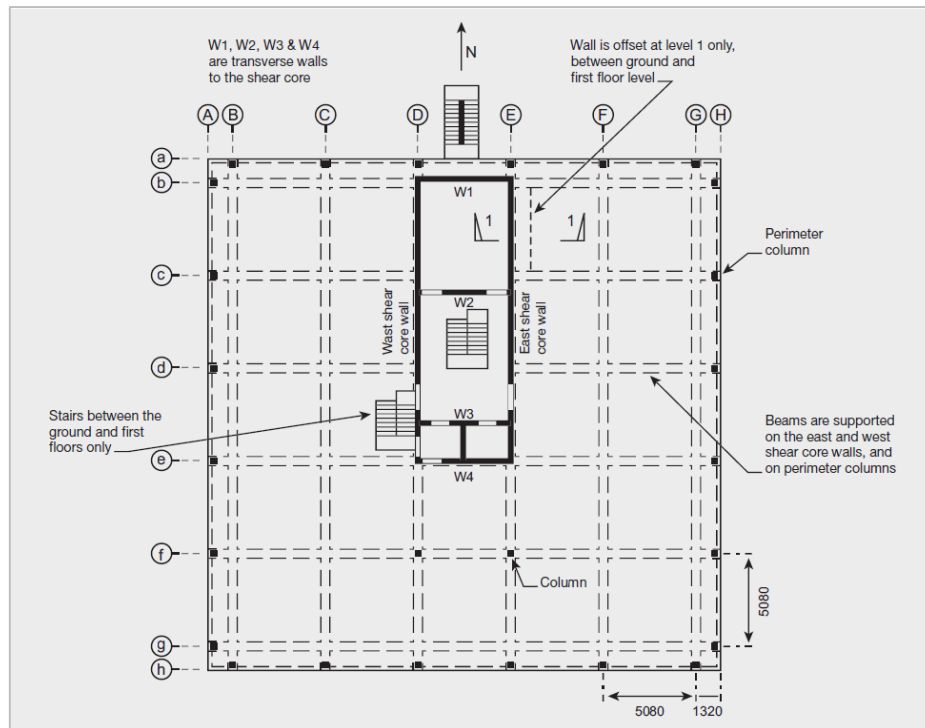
PGC typical upper level building plan, (CERC, 2012b)
